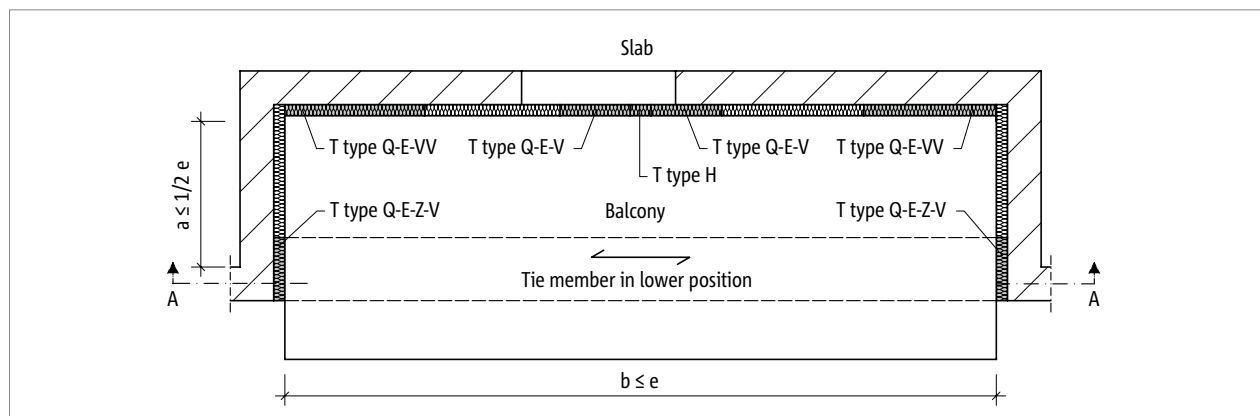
Schöck Isokorb® T type Q-E-Z-V: Layout of recessed balcony - symmetrical
